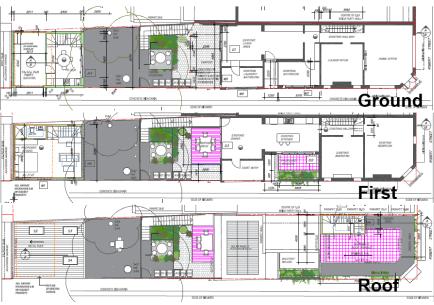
Amended DA floor plans, ALINEA DZINE Pty Ltd dated 24/10/2024
